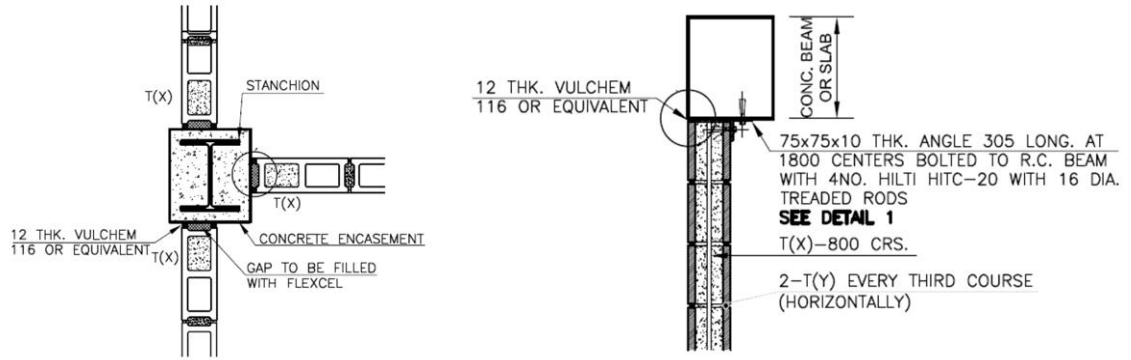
Construction drawings for bracket connections of the infill wall and provision of an isolation gap
